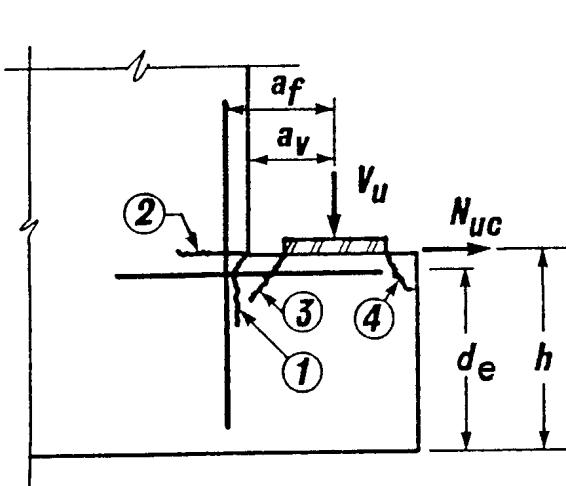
Notation and Potential Crack Locations for Ledge Beams
